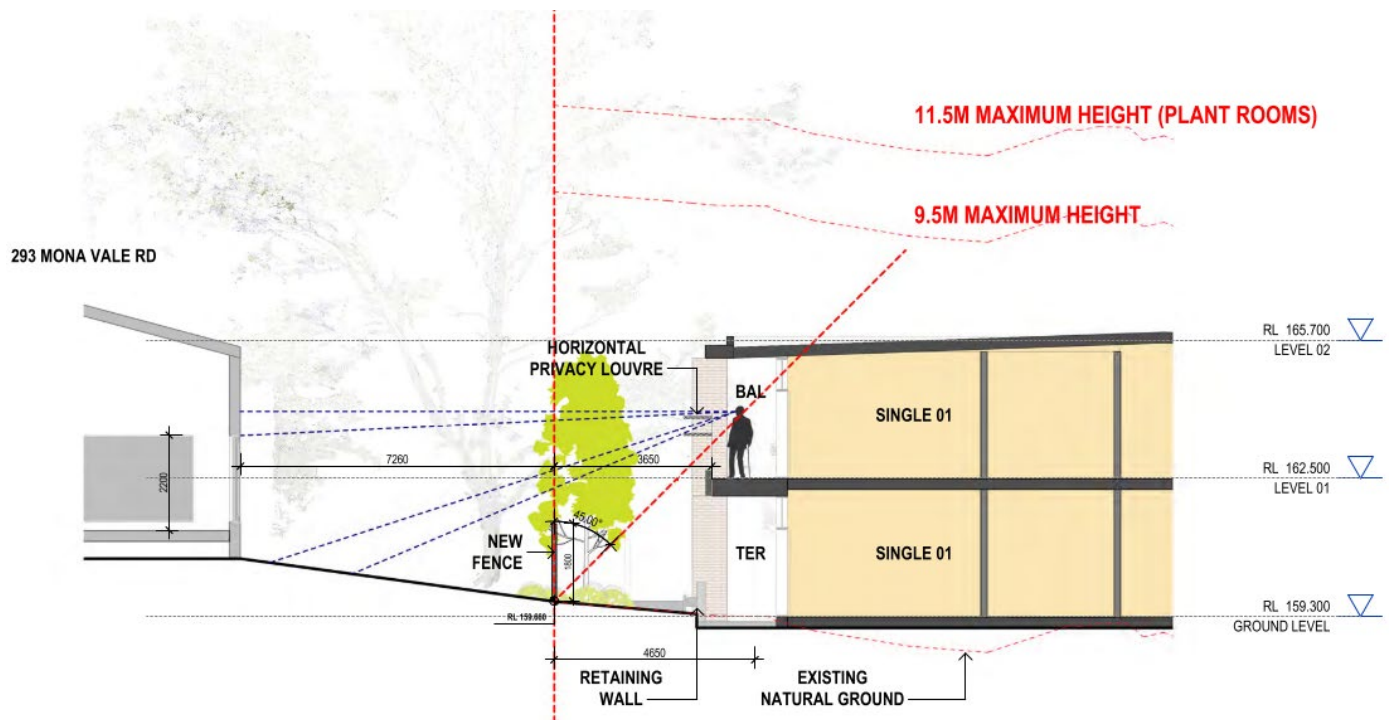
| Section plan showing relationship between the north-eastern boundary of the site and 293 Mona Vale Road, St Ives
